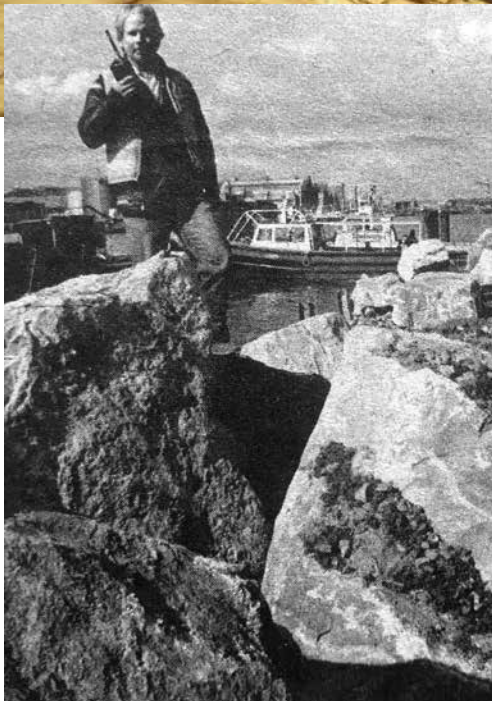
Placing Bed Protection between Pier 1 and Pier 2
